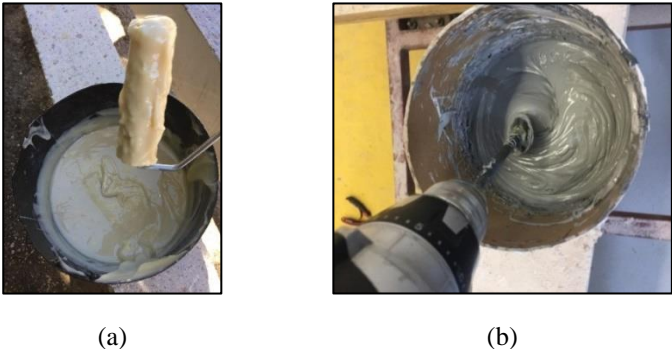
Epoxy resin material for bonding the CFRP (a) sheets and (b) plates
